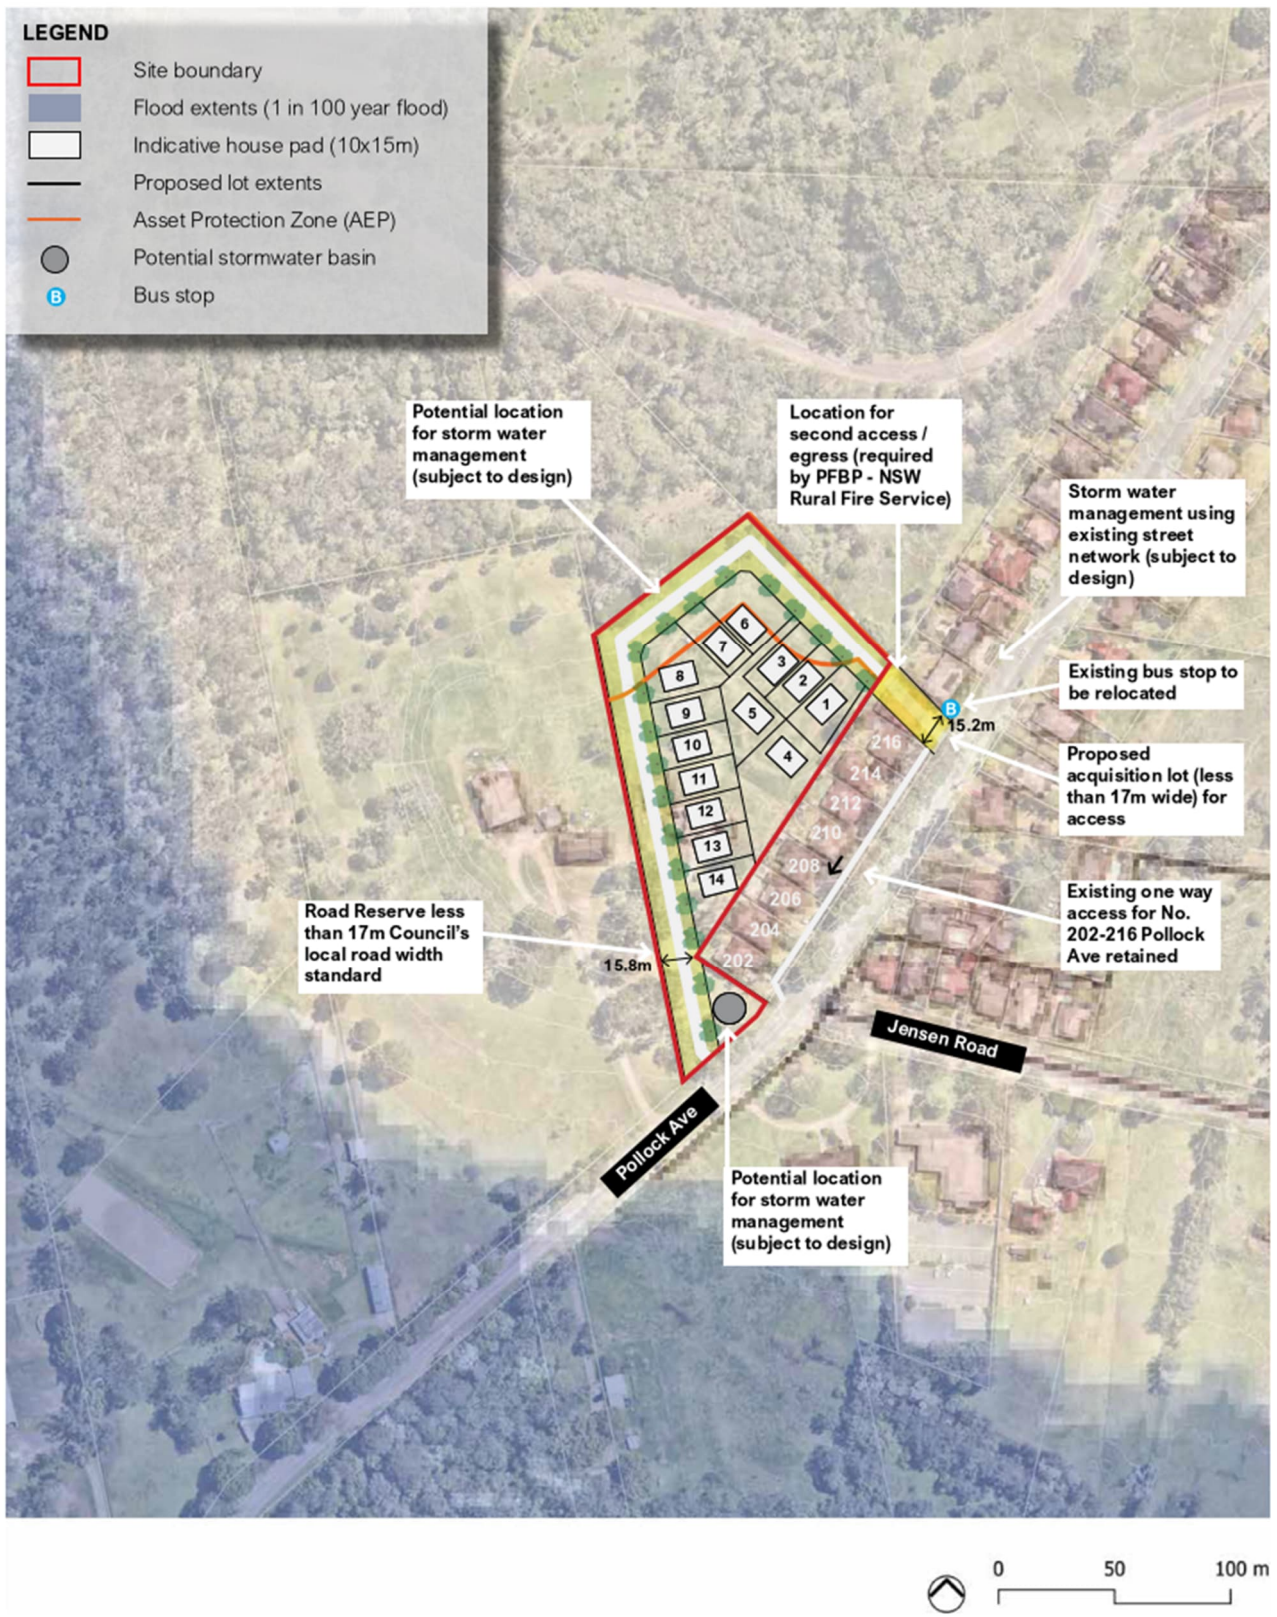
Indicative concept plan (based on standard minimum 450m² lot subdivision)
